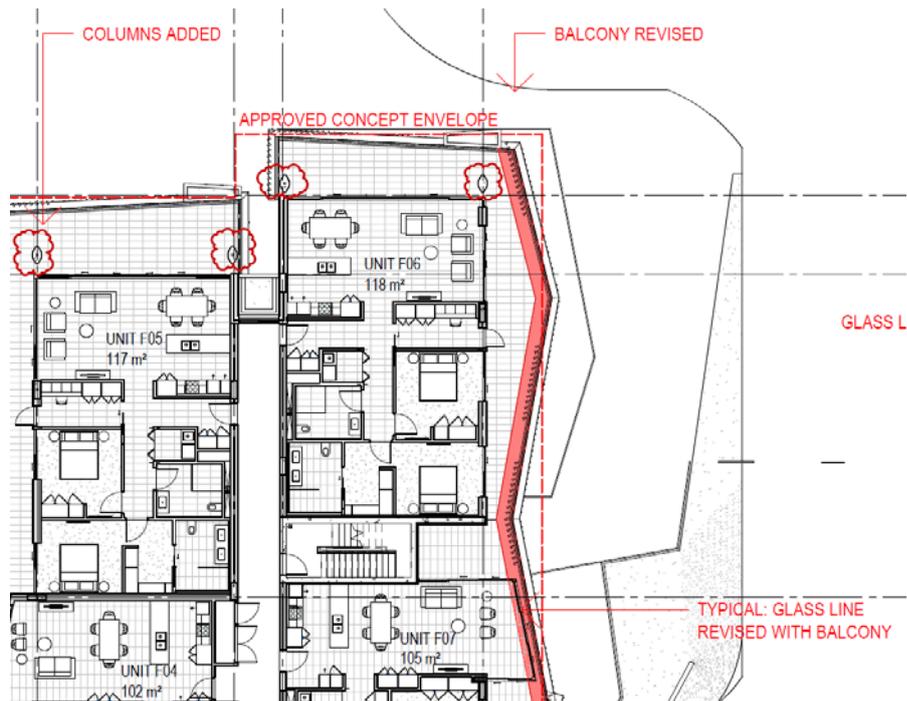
Insert from proposed Upper Ground Floor for Building F showing example of revised balcony and glass line in conjunction with the approved building envelope.
